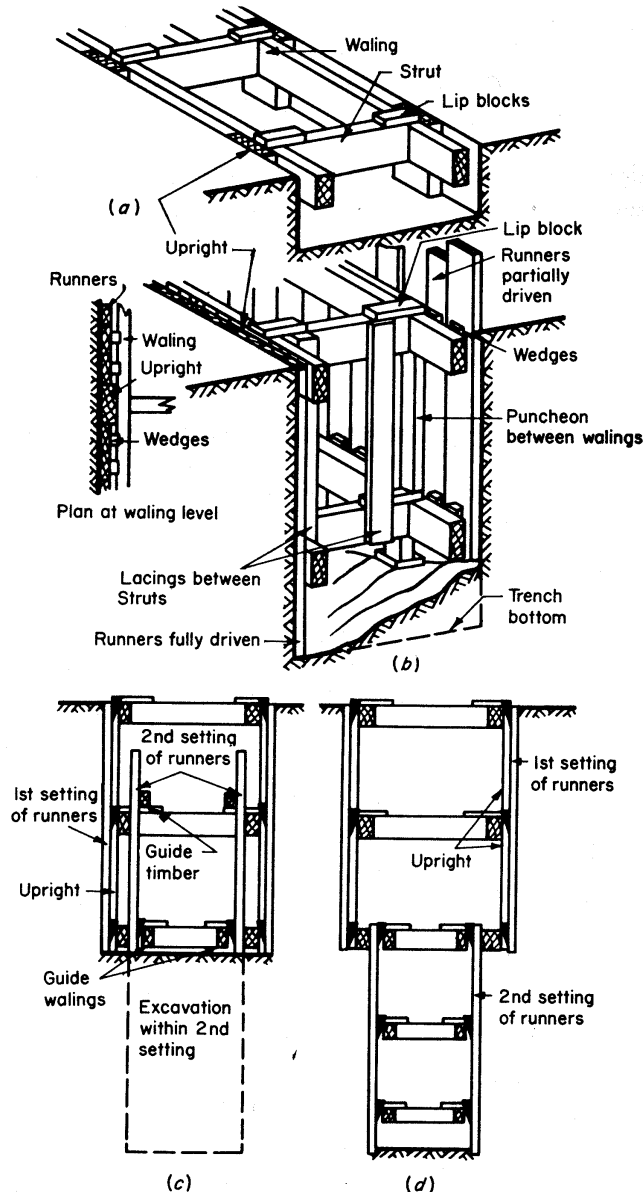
Support of excavations in loose soil with runners. (a) First-stage excavation. (b) Second-stage excavation. (c) Pitching second set of walings. (d) Second setting of runners.
